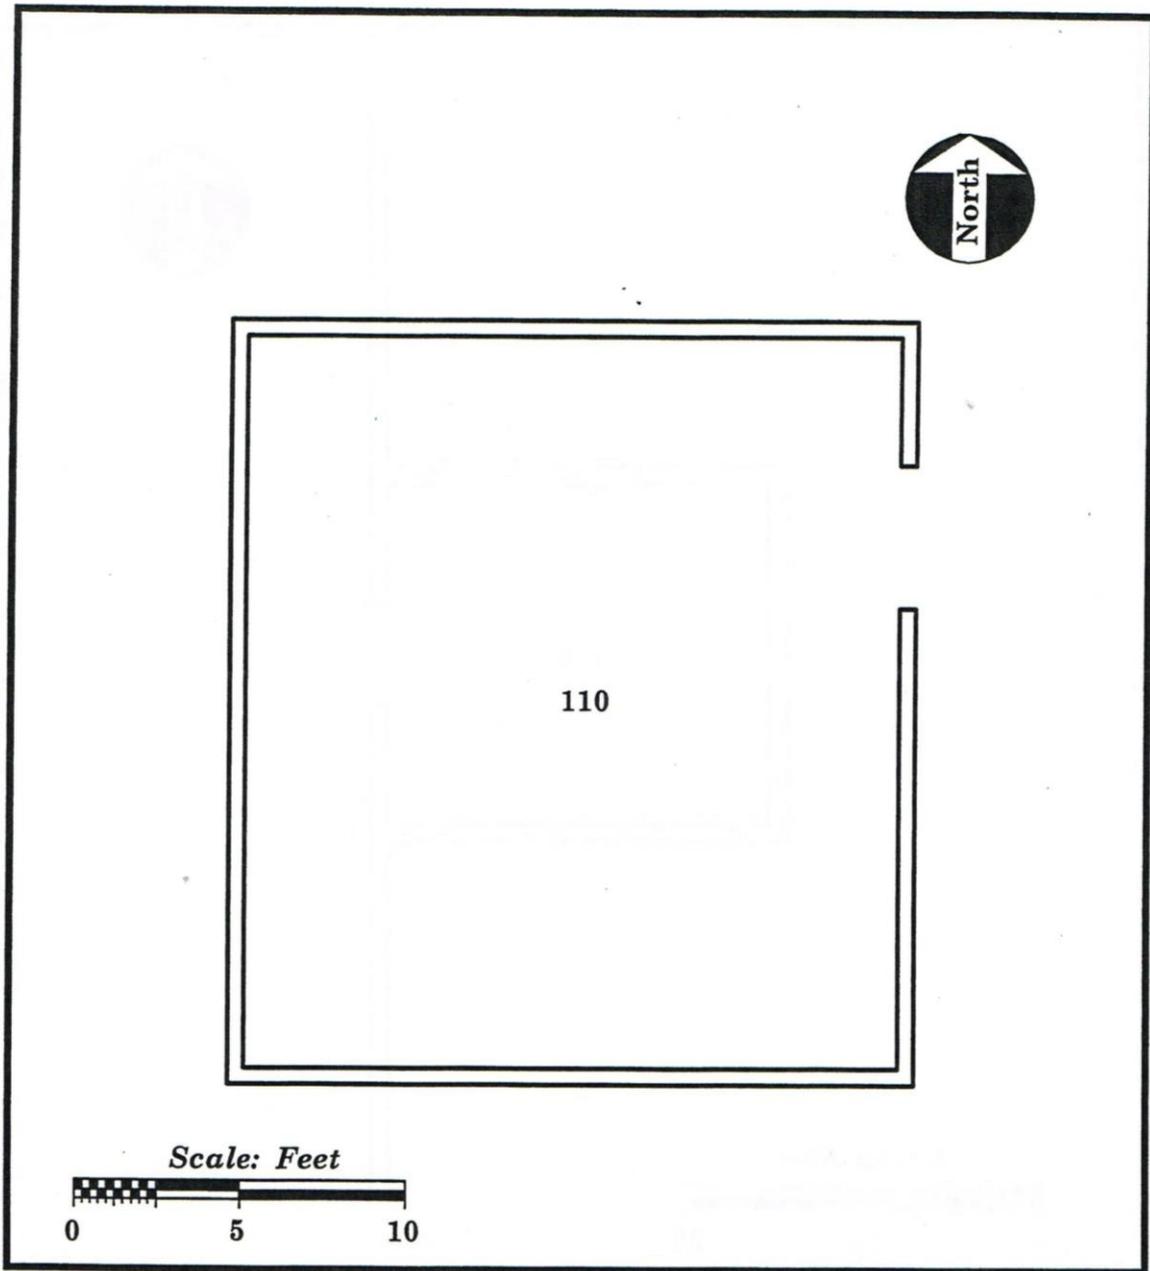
Building 817G, Facility Plot Plan, 1997. LLNL Archives, (Figure A-16)
